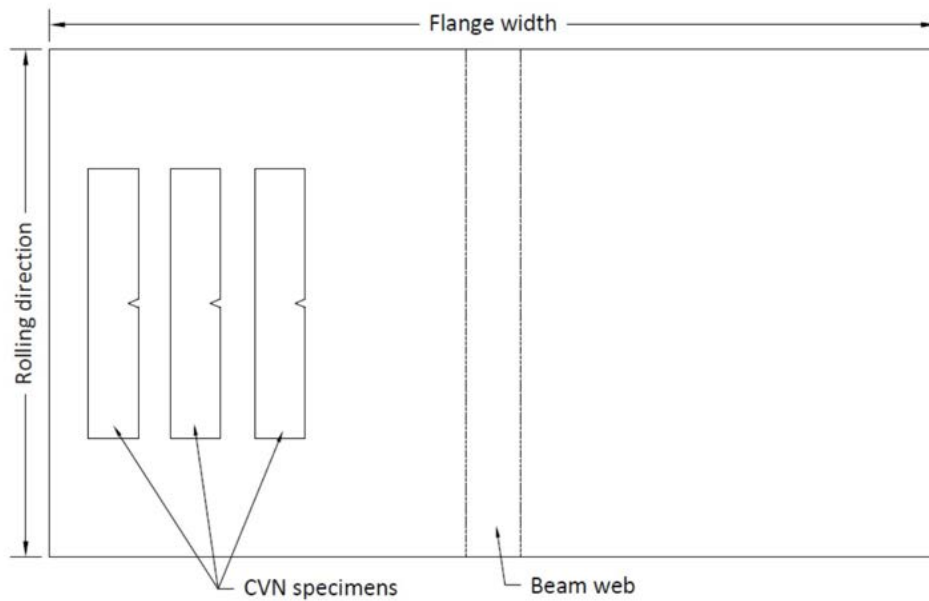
Plan view of CVN specimens cut from beam flanges.
